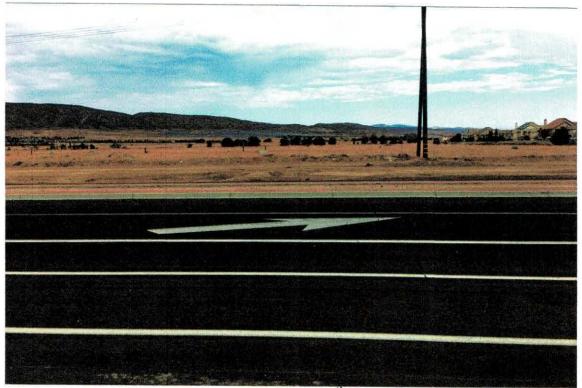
Looking west from the site across 60th Street W at vacant property. No
